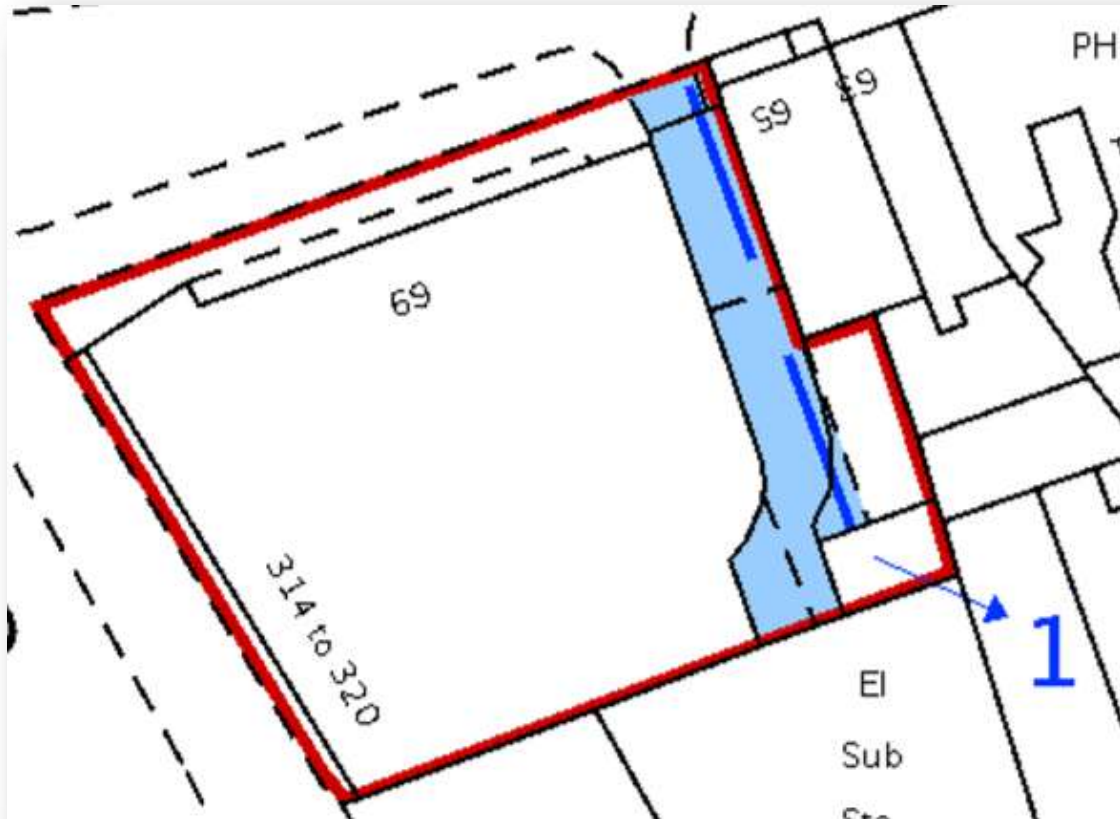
Extract of title plan denoting existing sub-station ([1](#))
